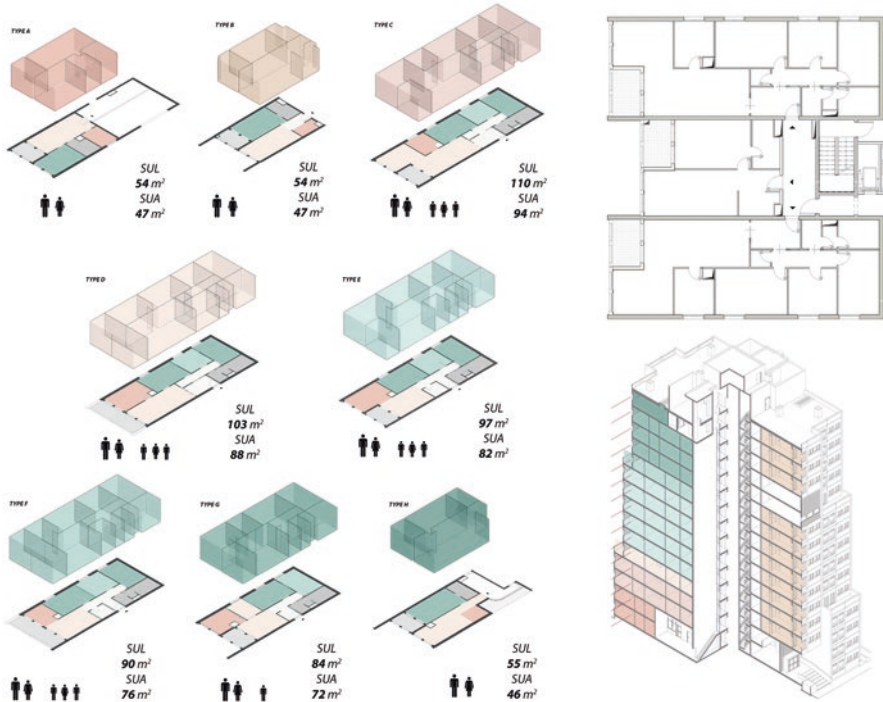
Actual situation: flat types, typical floor plan and axonometric section with flat types
